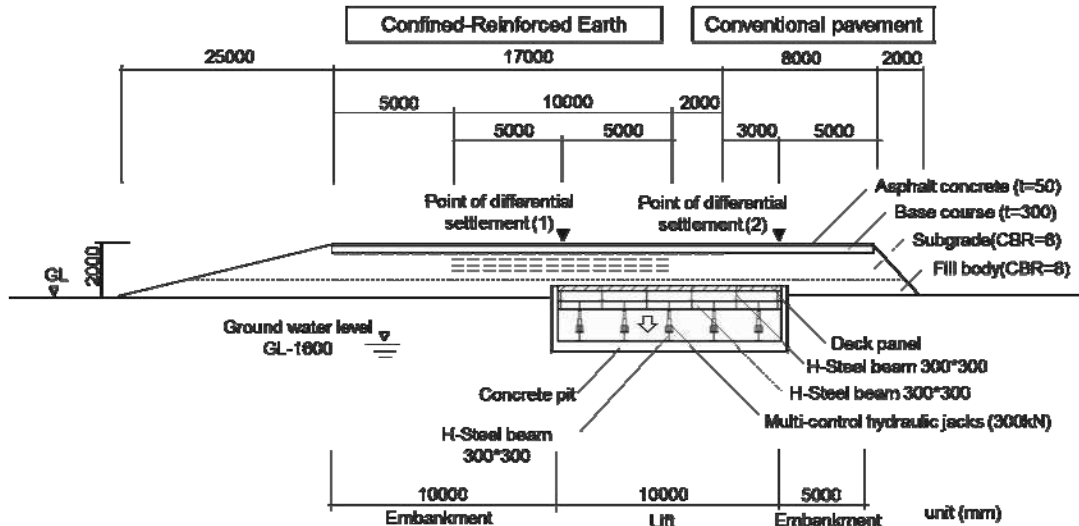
Layout of the trial embankment (Constructed and tested in Ibaraki, Japan, 2011)
